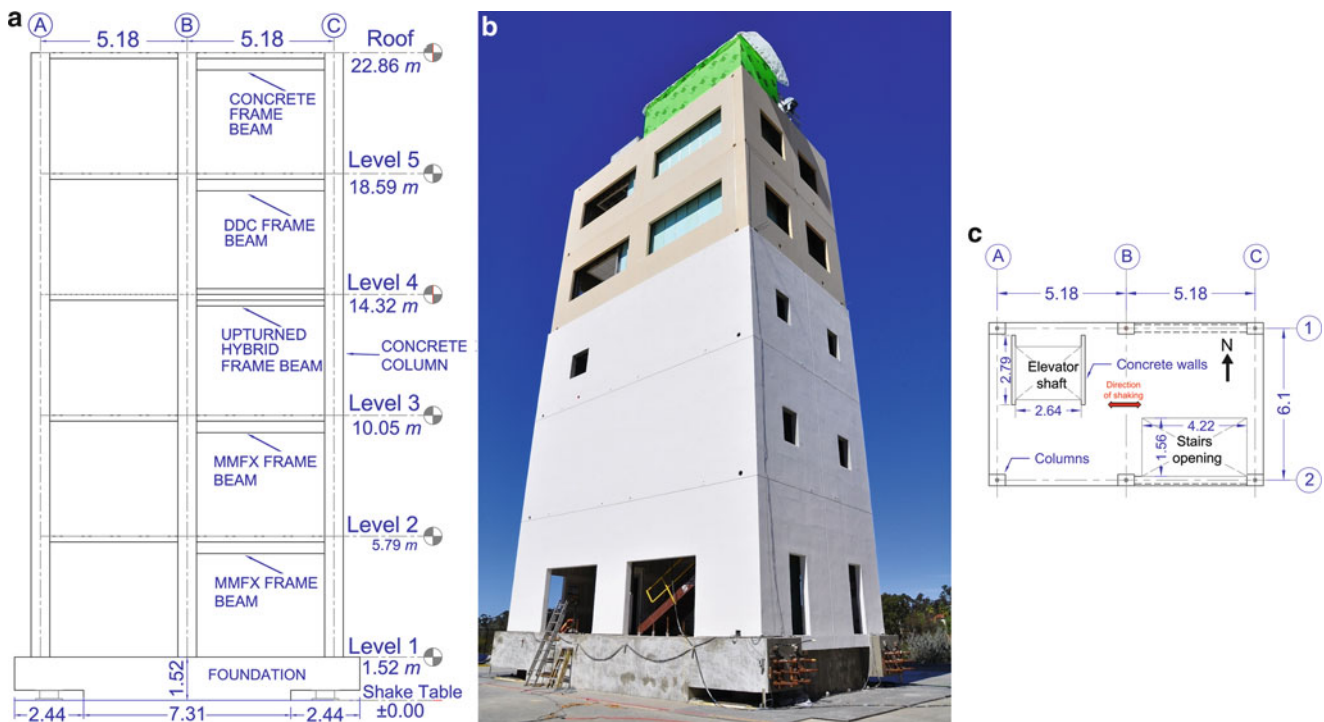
Test specimen (a) schematic South elevation view, (a) completed structure, (c) schematic plan view
